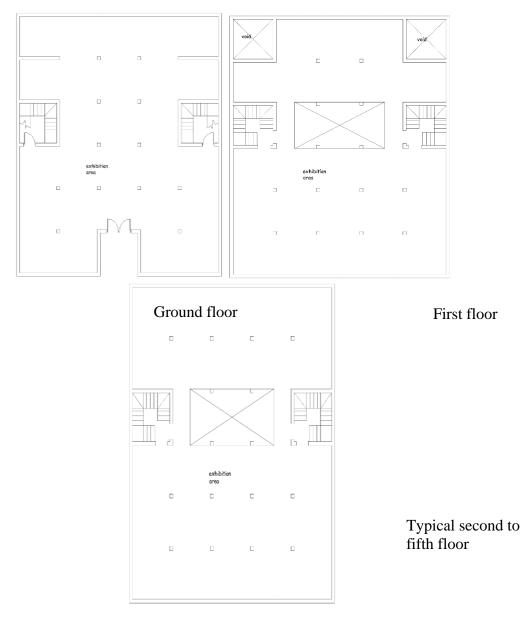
Floor plans of Nike art gallery, Lekki, Lagos Source: Author's fieldwork (2021)
